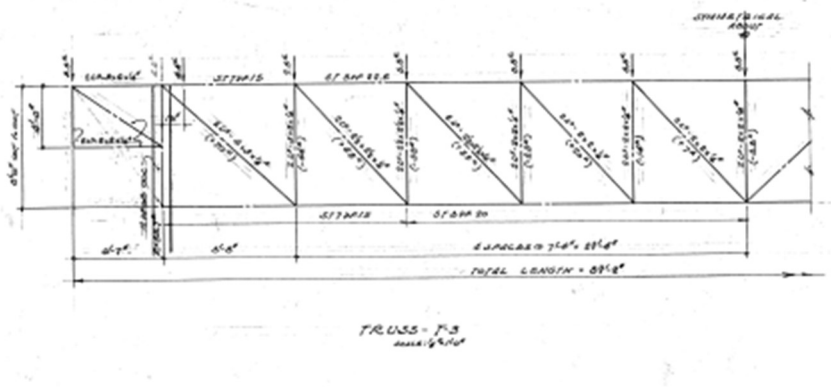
Truss T-3 Profile from CFAC Roof 4.
